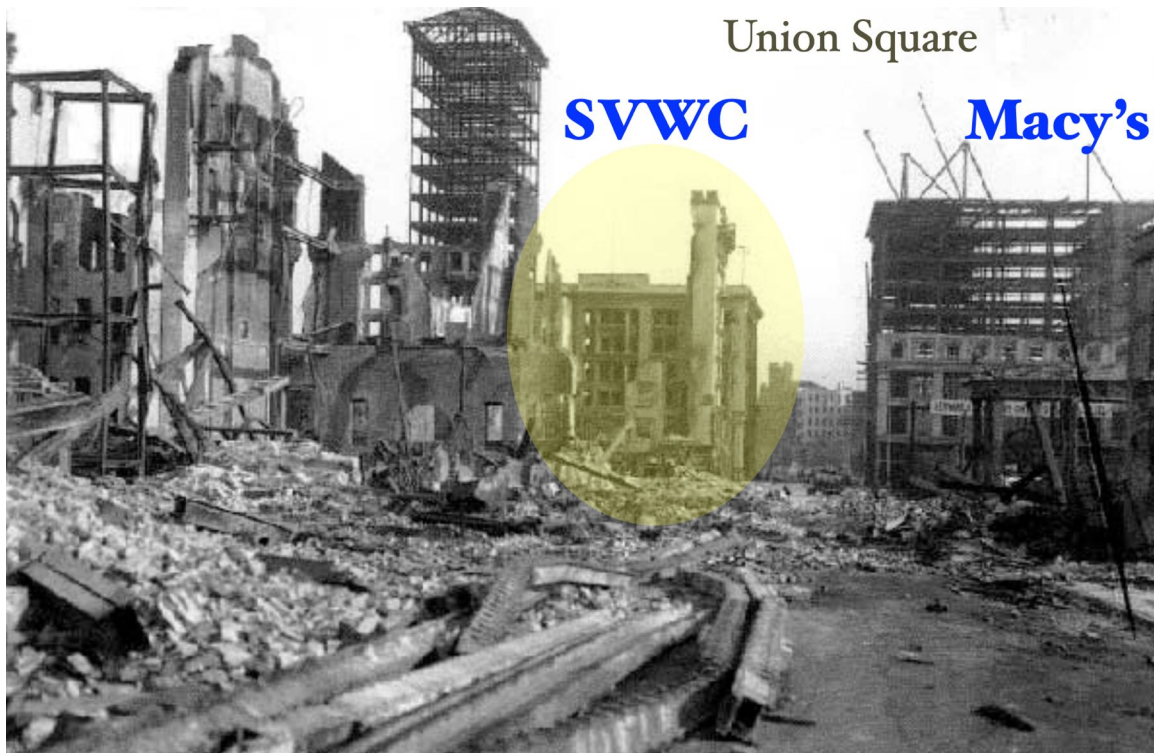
SVWC Office Building, Looking South, After 1906 Fire
